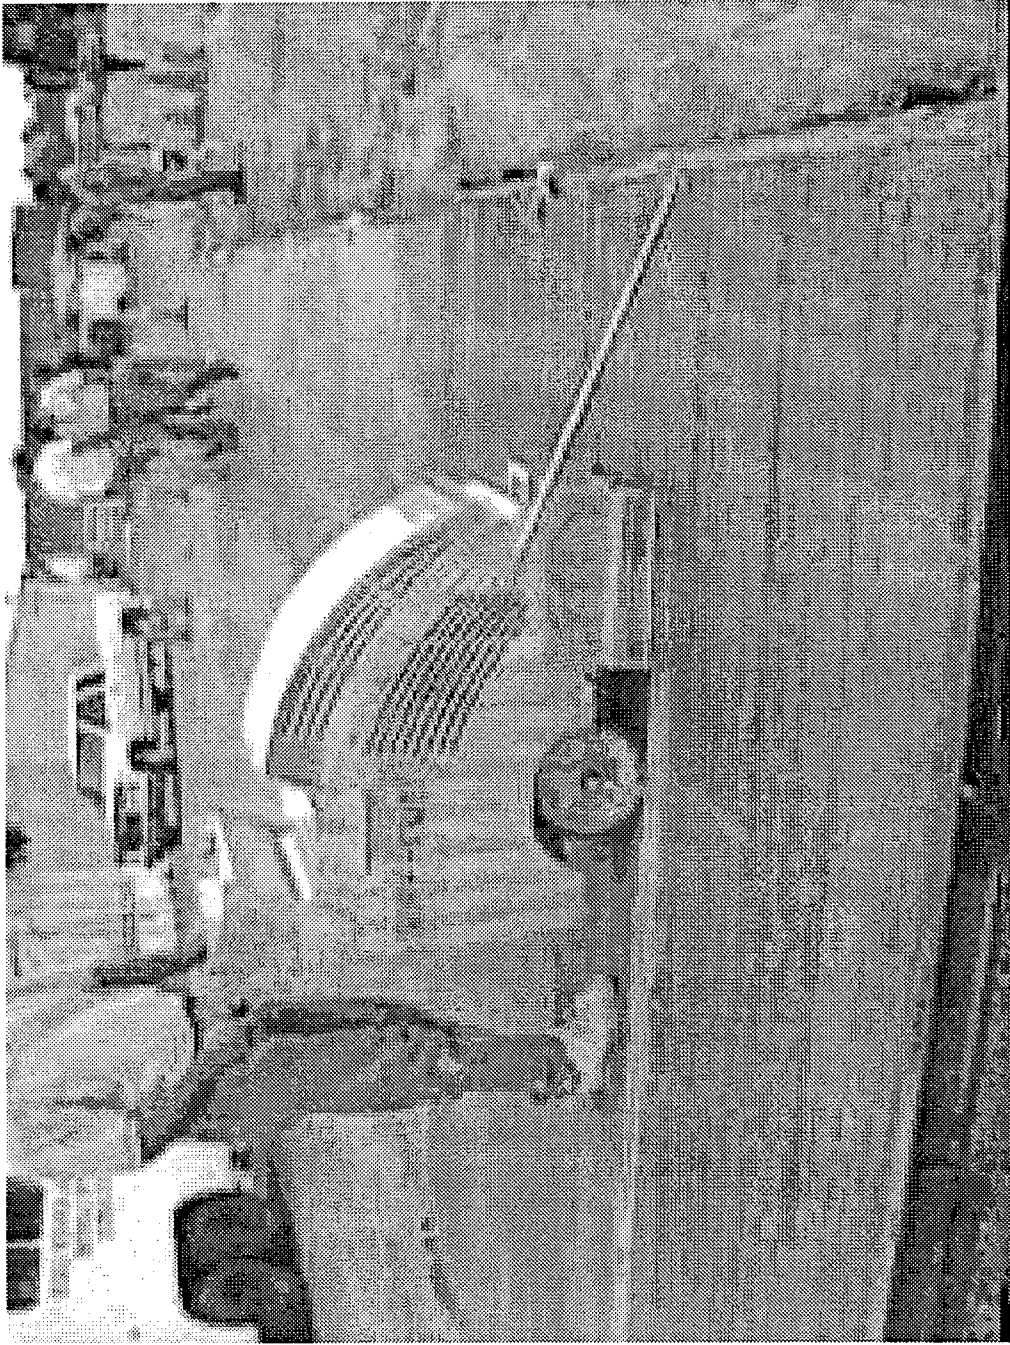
Joint Cutting 8 Hours After Placing Concrete
